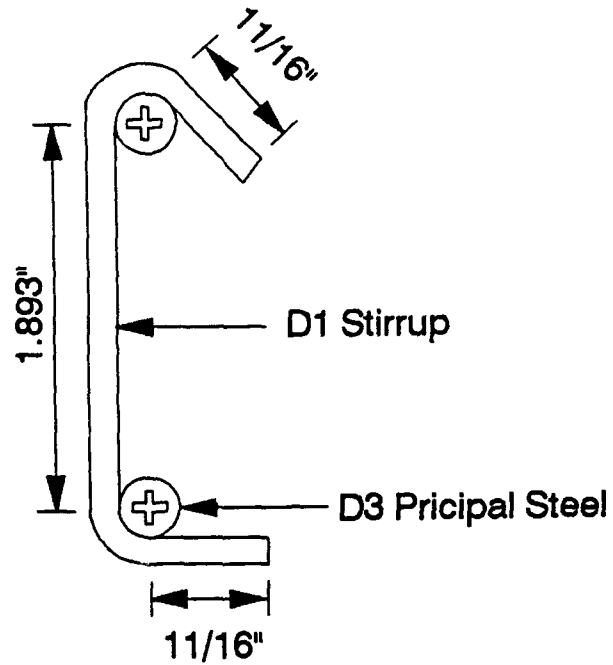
Stirrup Details for Slabs with D3 Principal Steel
